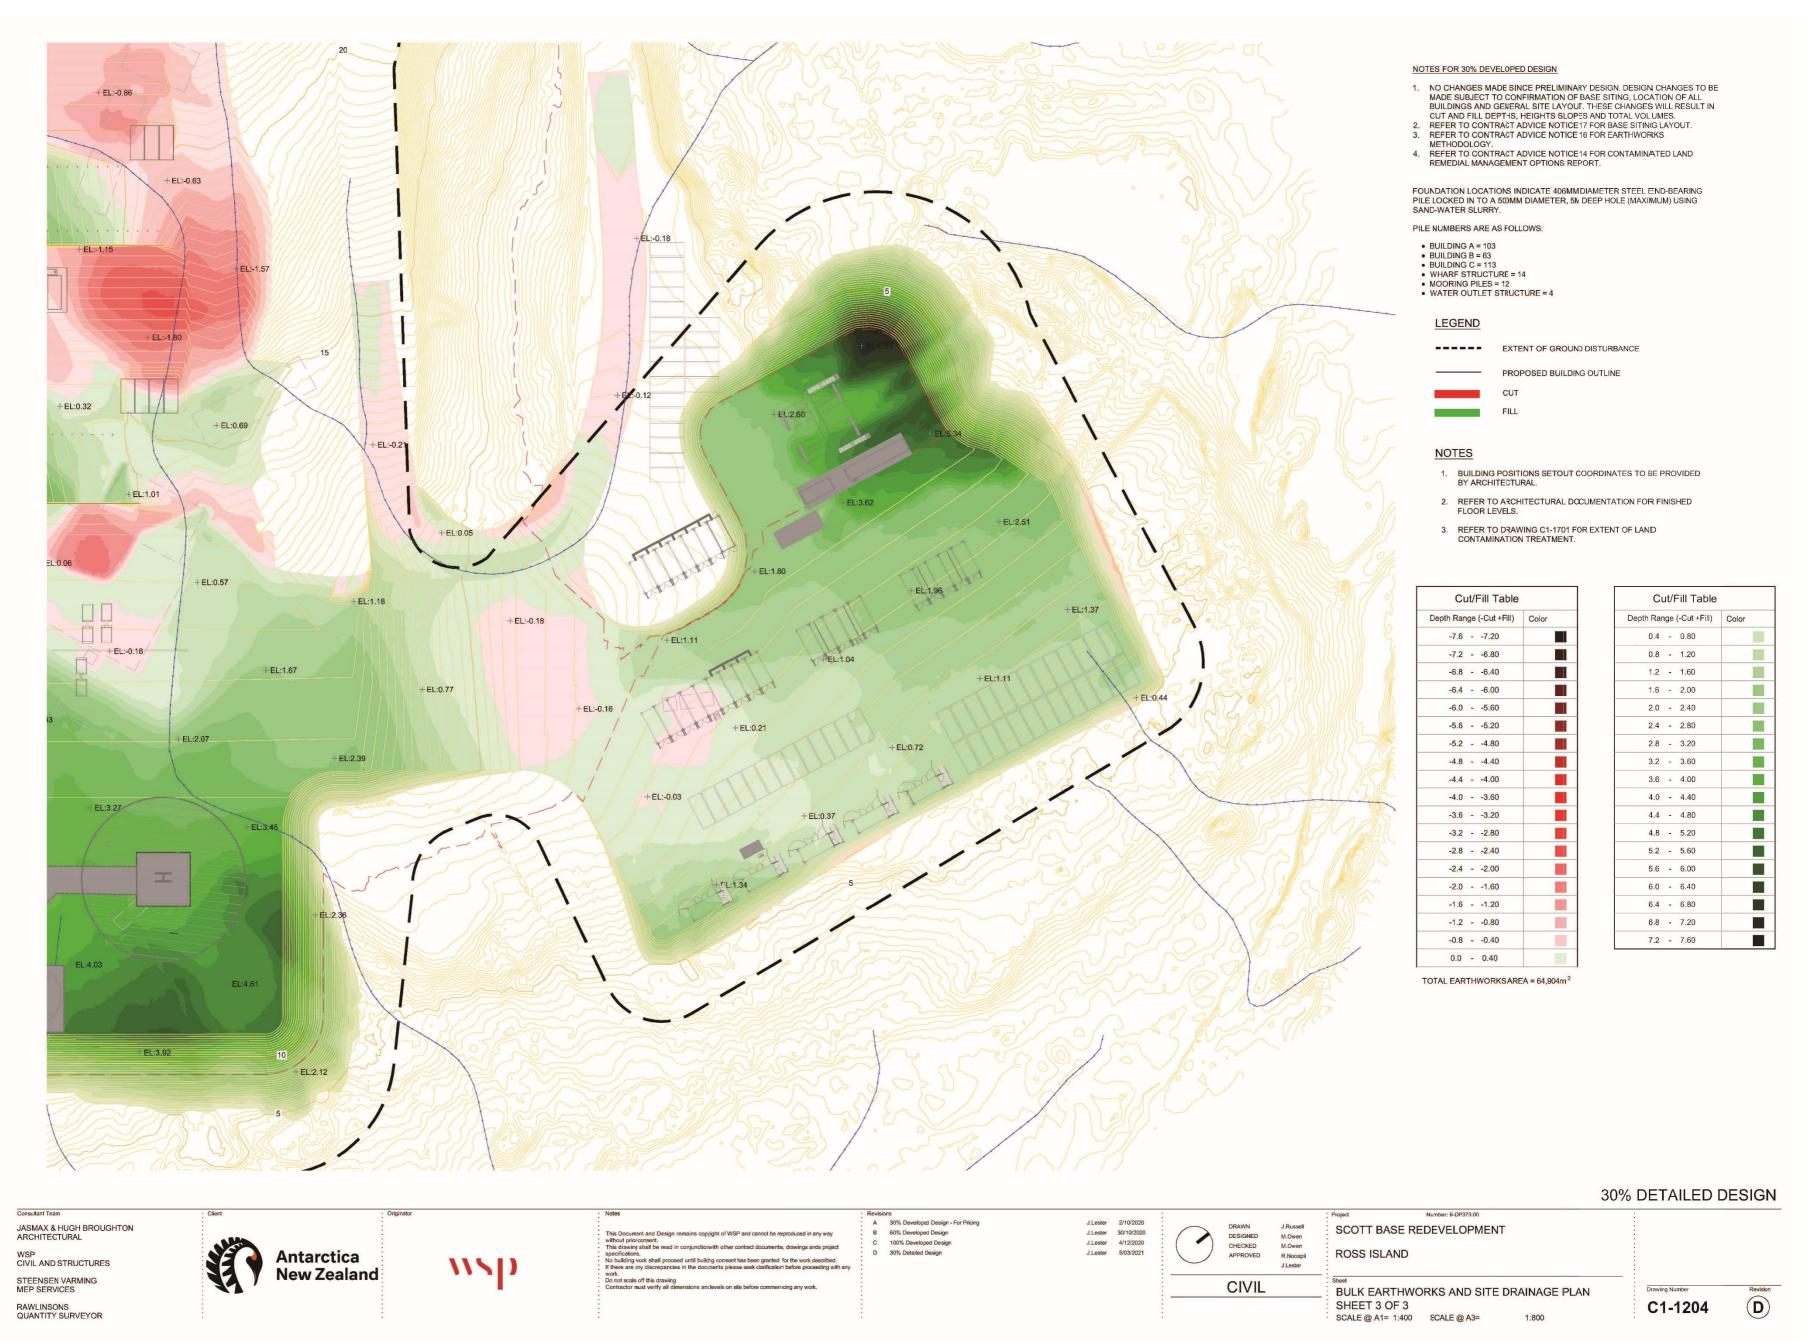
Detail of bulk earthworks with location of the proposed container line and bulk fuel storage. This is also the proposed staging location for construction equipment and the current buildings for removal (WSP, 2021).
